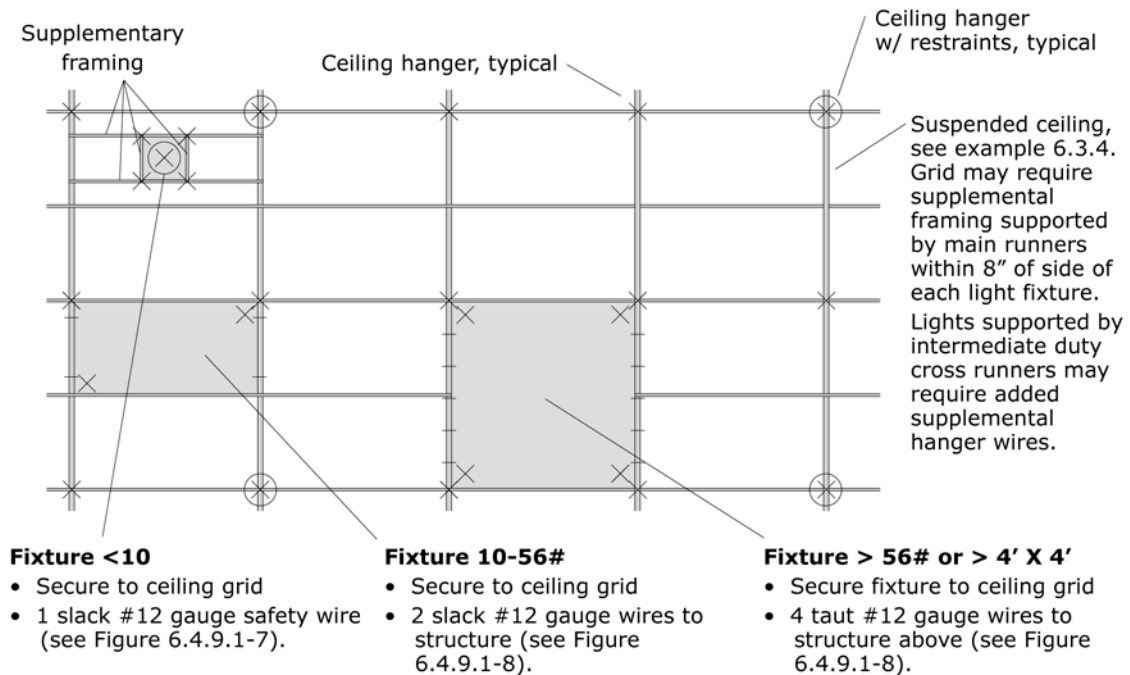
Schematic plan of recessed lights in suspended acoustic ceiling (PR).
